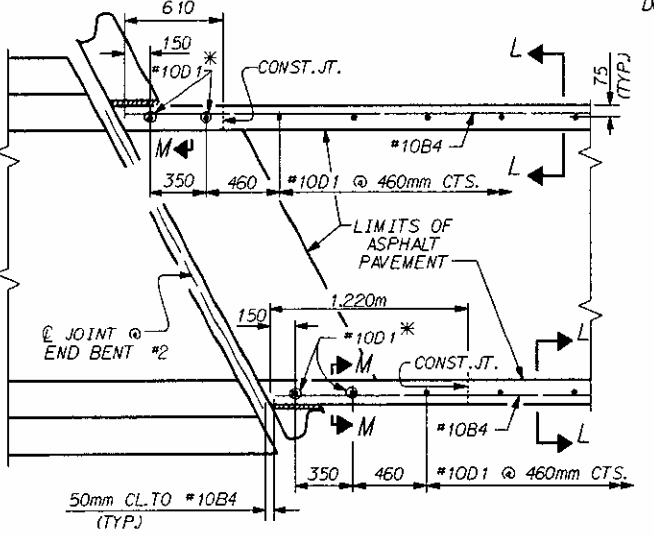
DETAIL AT END OF CURB WITH SPECIAL DRAINAGE
